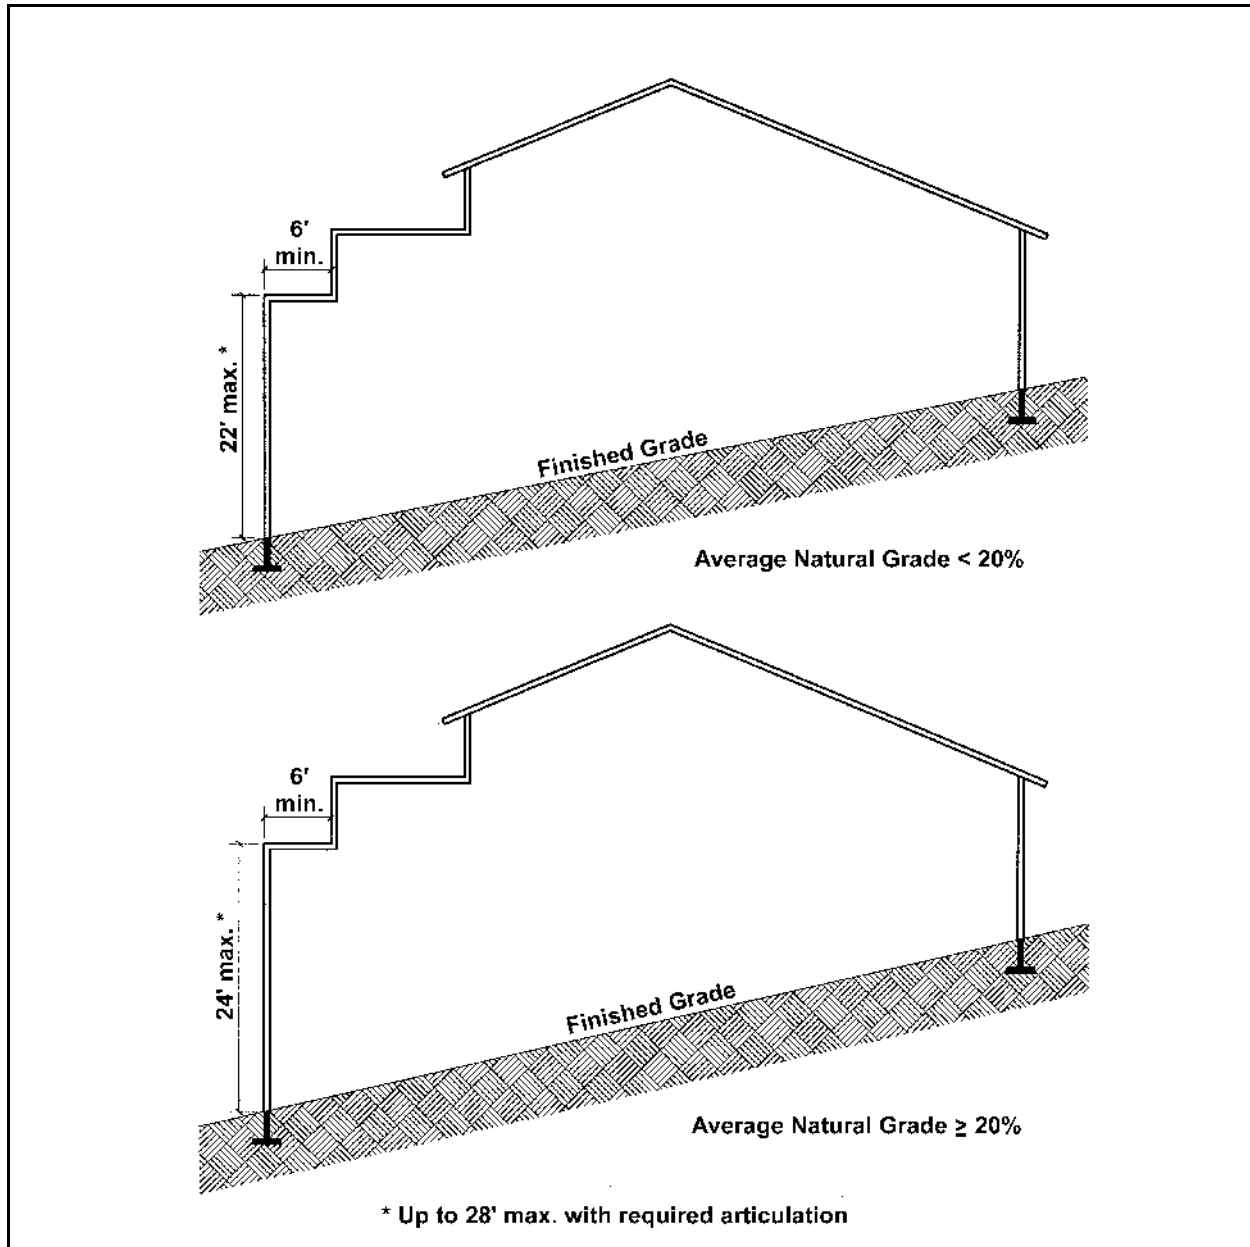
Front and Rear Building Face Height and Setback--Residential Single Family Outside Community Small-Scale Design Neighborhoods
